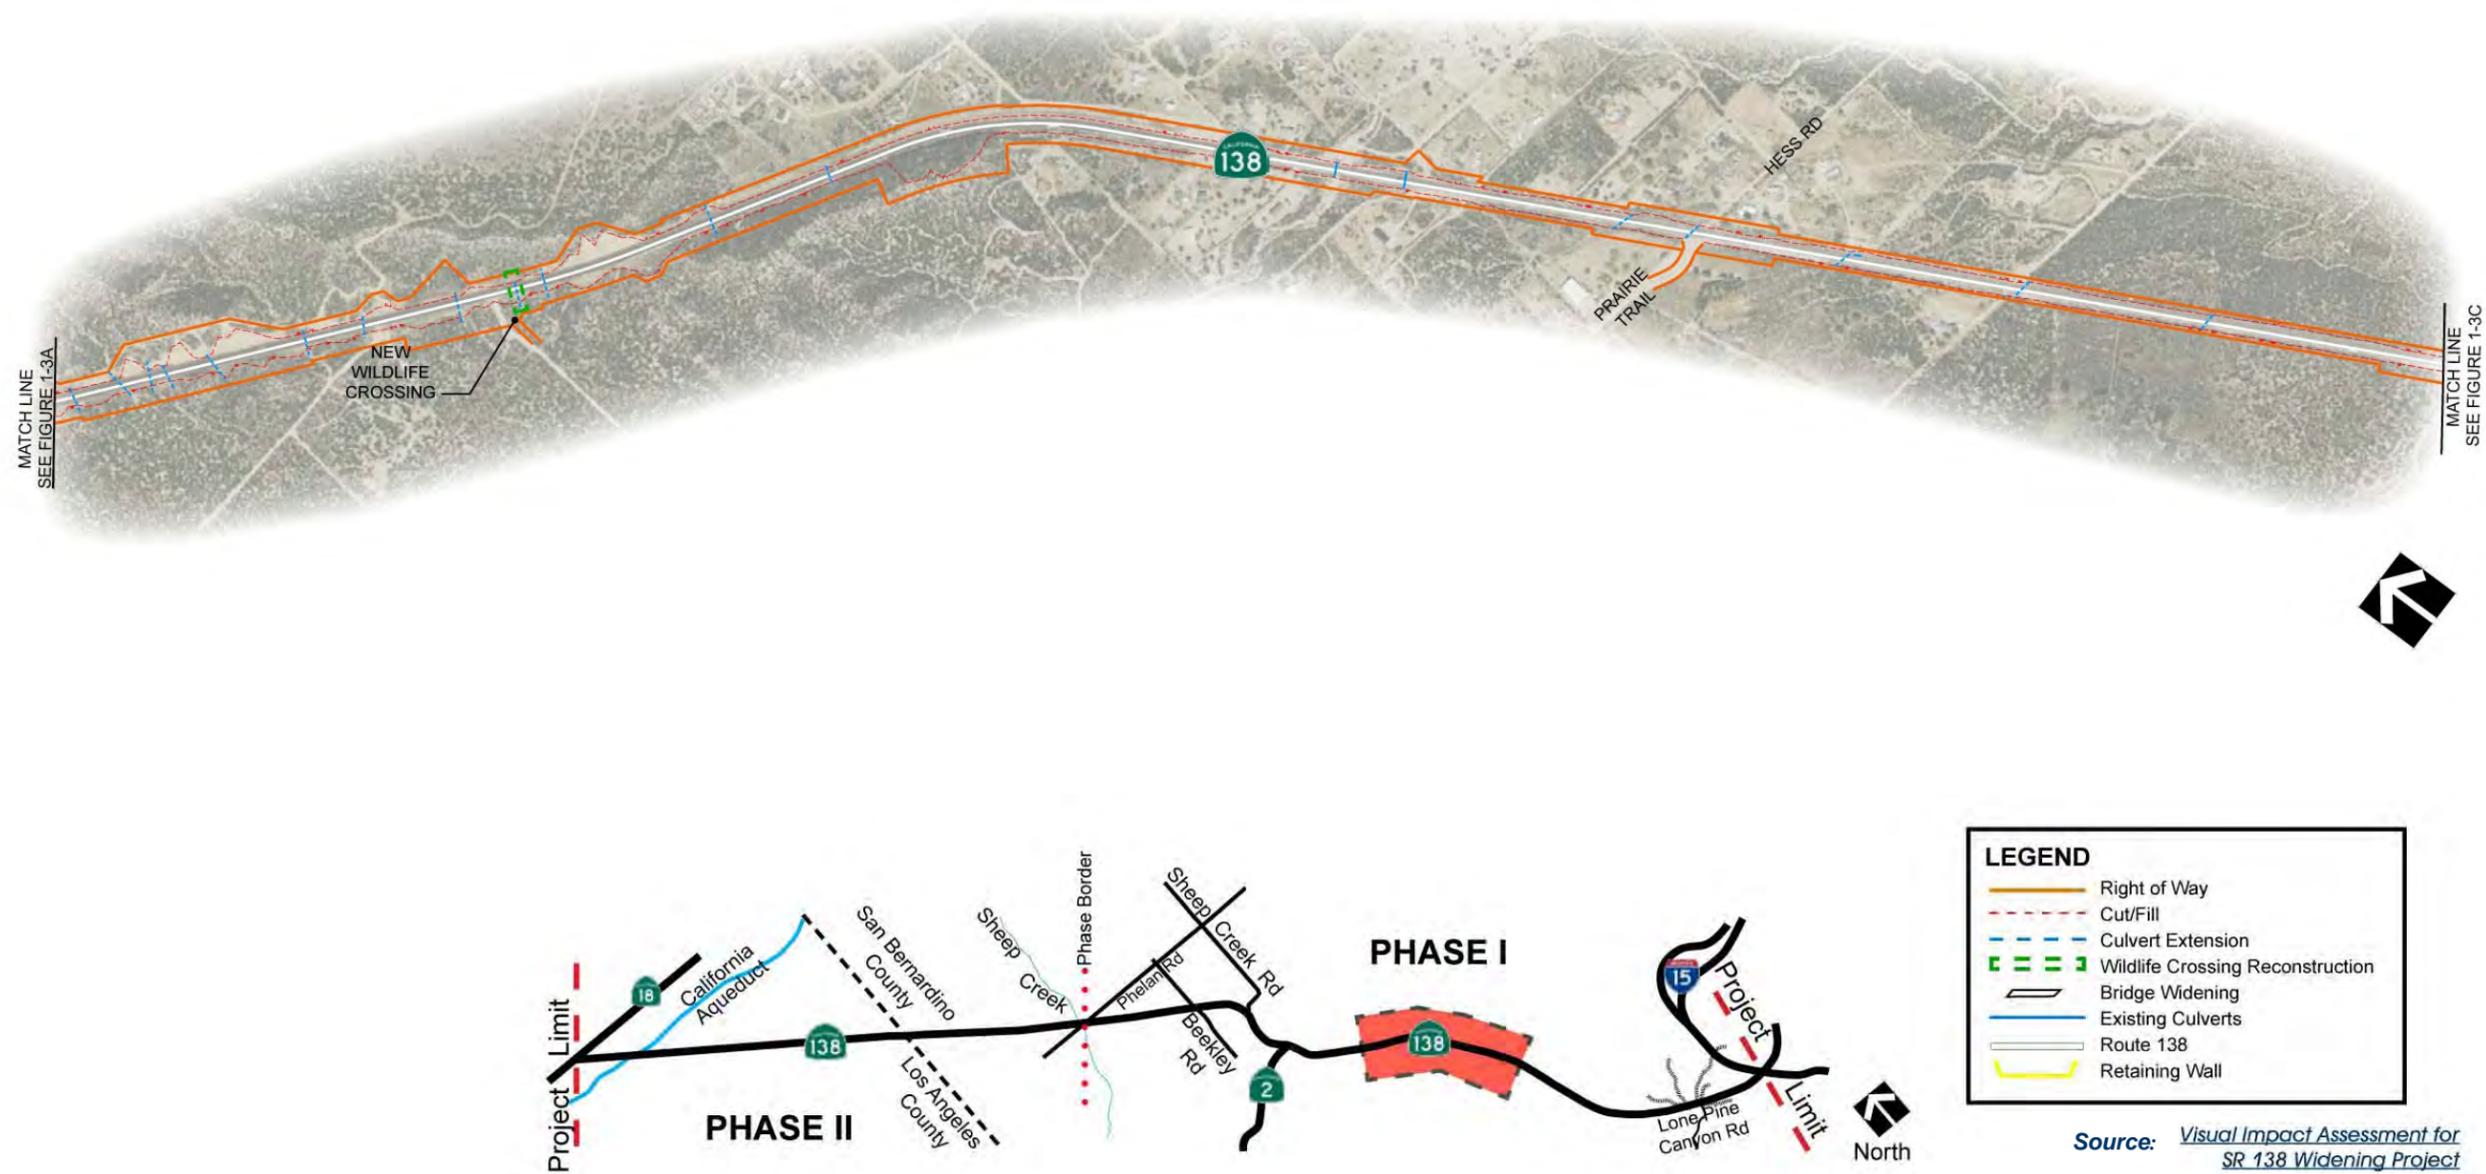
C. Build Alternative, Proposed Widening and Project Features
